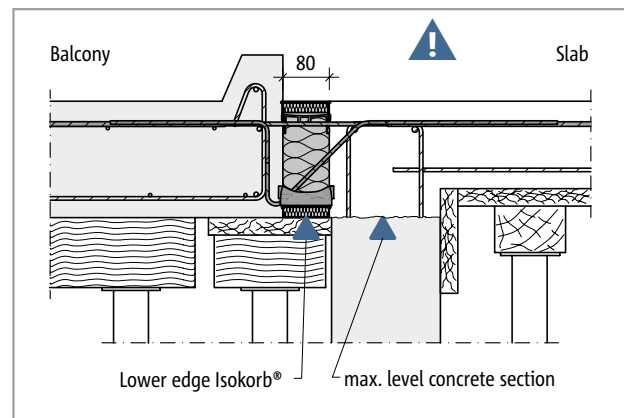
Schöck Isokorb® T type K: Fully-finished balcony with height offset floor on fully-finished reinforced concrete wall
